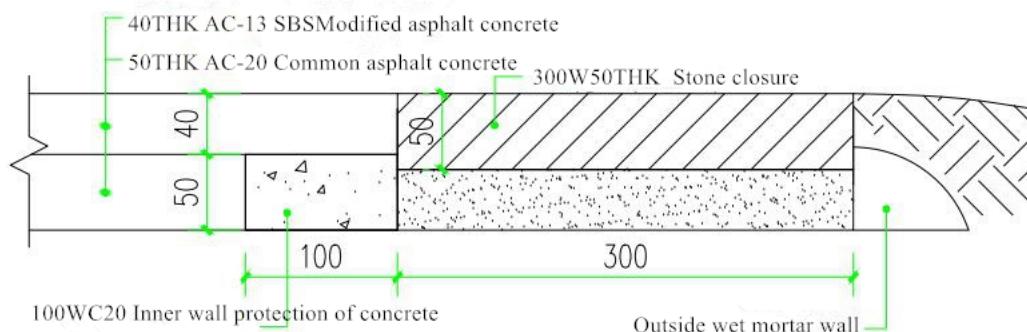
Technical Key Points of Ultra-Thin Asphalt Concrete Deck Paving
